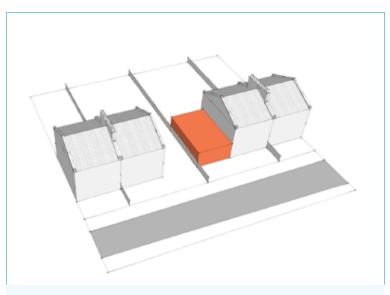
Unacceptable single storey side extension – flush with the front elevation and built up to the common boundary.
